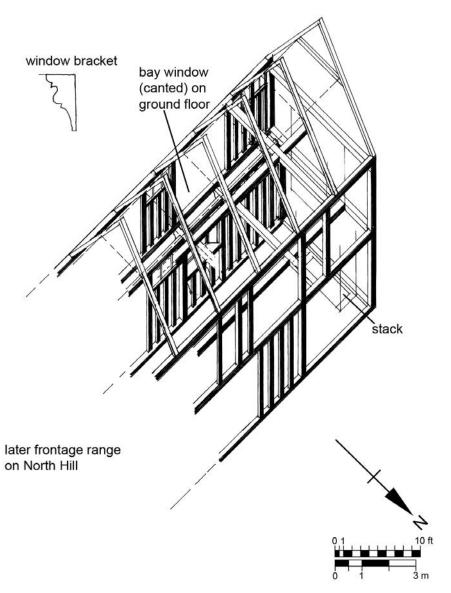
Isometric view of 47 North Hill (corpus no. 70). Inset of oriel bracket (not to scale)
